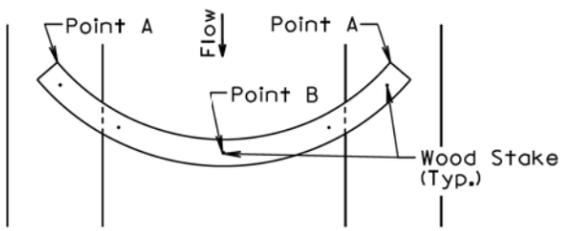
DETAIL B (TYPICAL OF ALL INSTALLATIONS)
